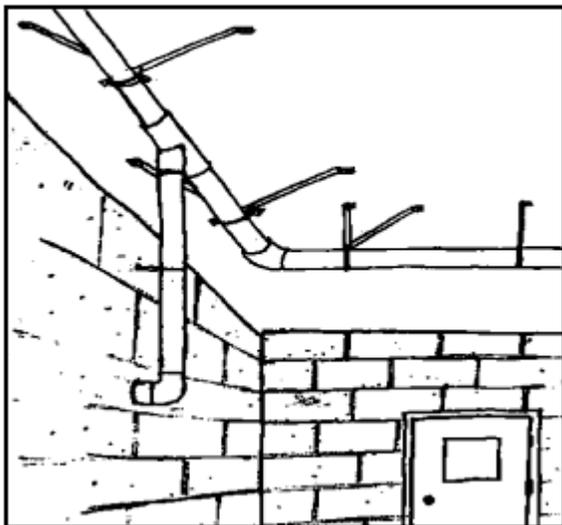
Typical Bracing of Overhead Utility Pipes
